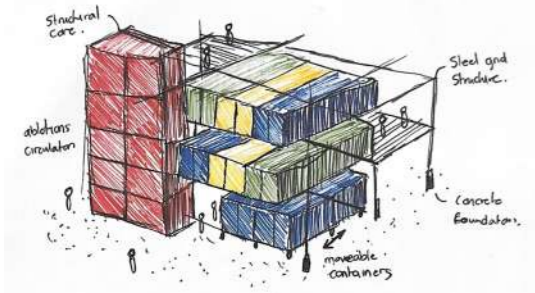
Review 3 submission showing rendered sectional elevation (Author, 2023)
